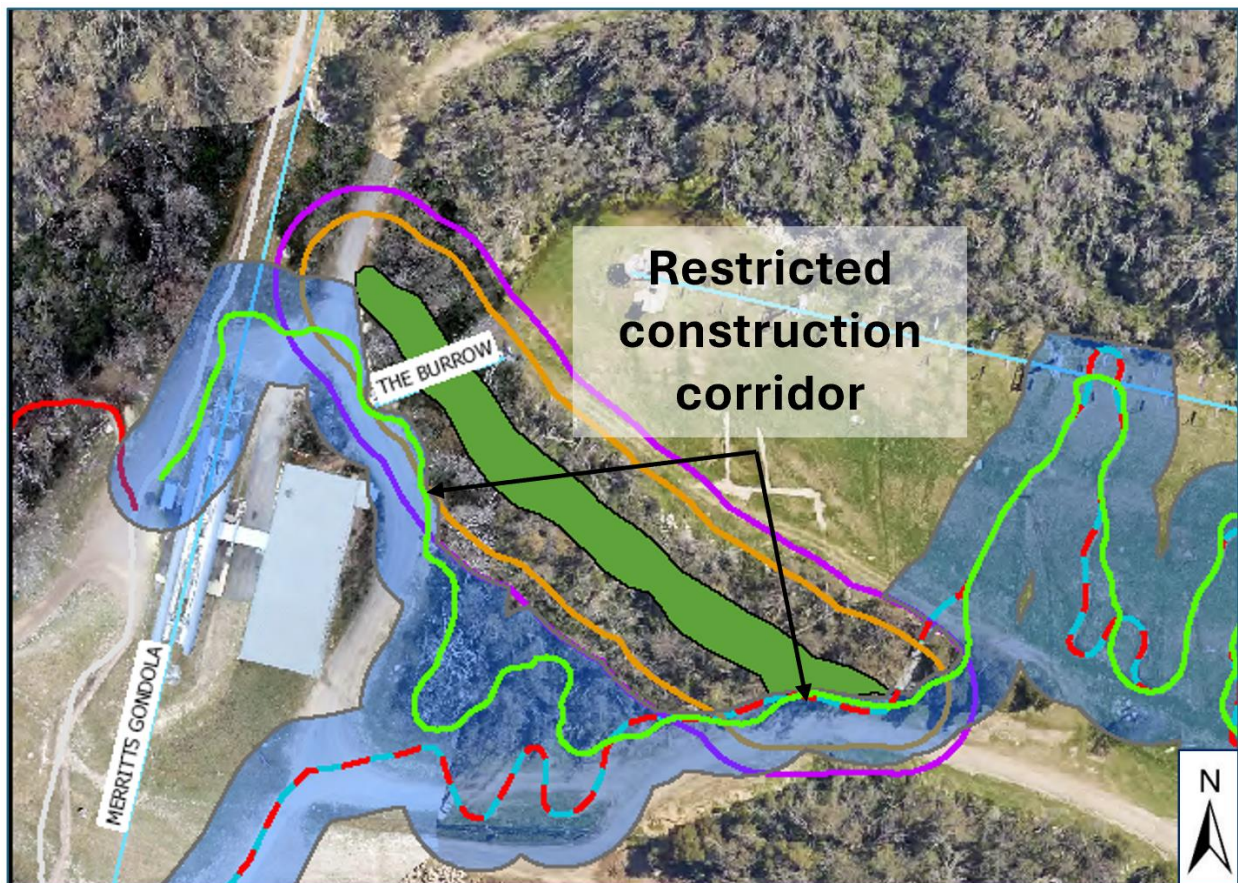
| Site plan identifying restricted construction corridors along the Beginner Mountain Bike Trail
